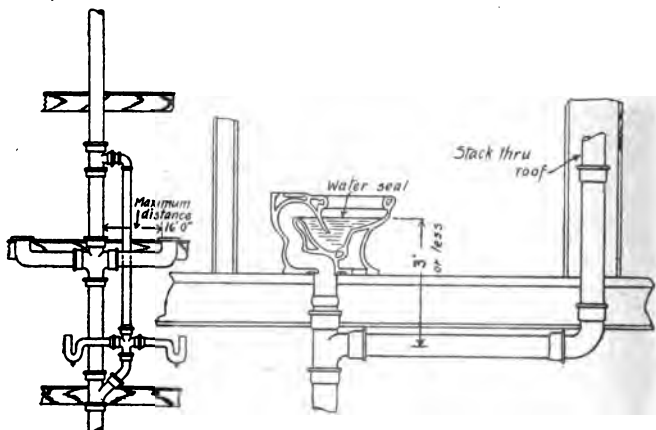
Showing extension of soil or waste branch. Sec. 7.
